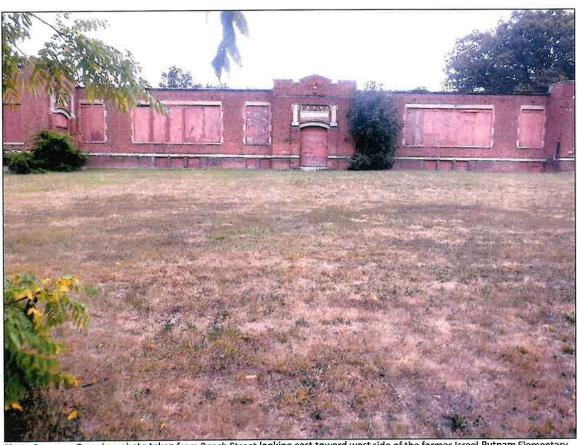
Overview photo taken from Beach Street looking east toward west side of the former Israel Putnam Elementary School in New Britain, Connecticut.
